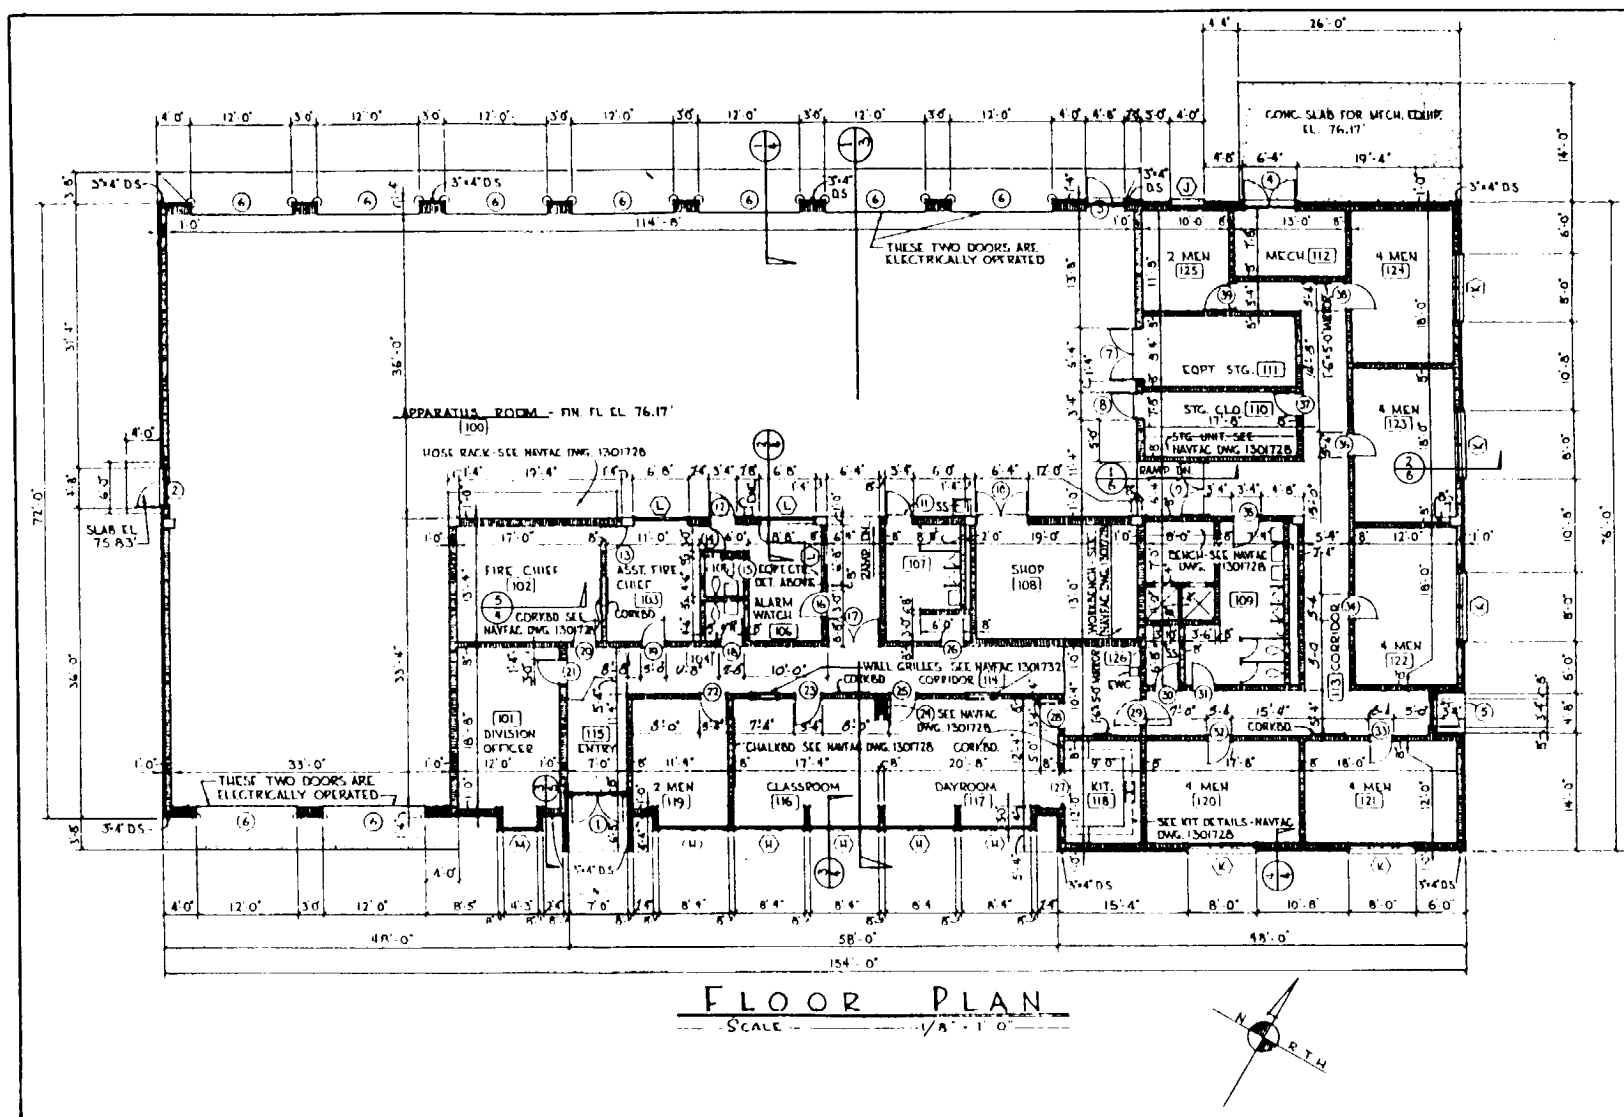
Example of a floor plan for a concrete-masonry construction.
